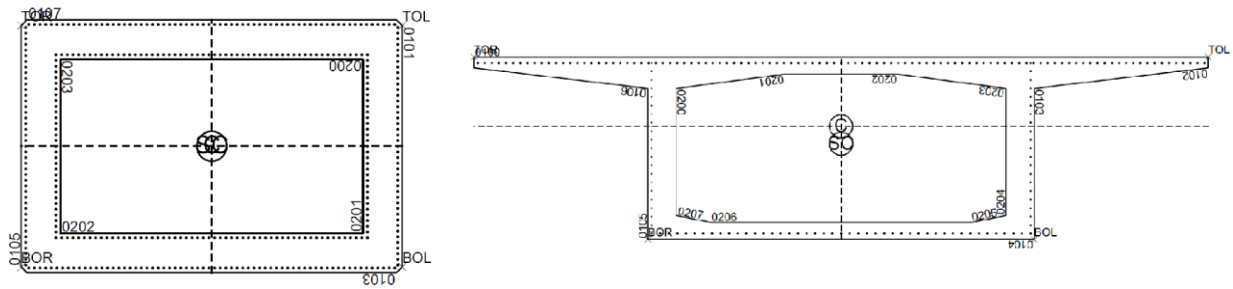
Example of generated cross sections: pier (left) and superstructure (right)
